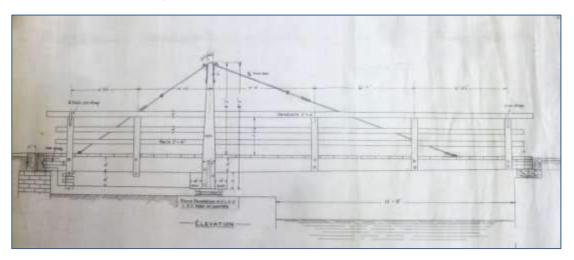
Details of the proposed1929 renewal work to swing bridges (CRT archives, Leeds)
